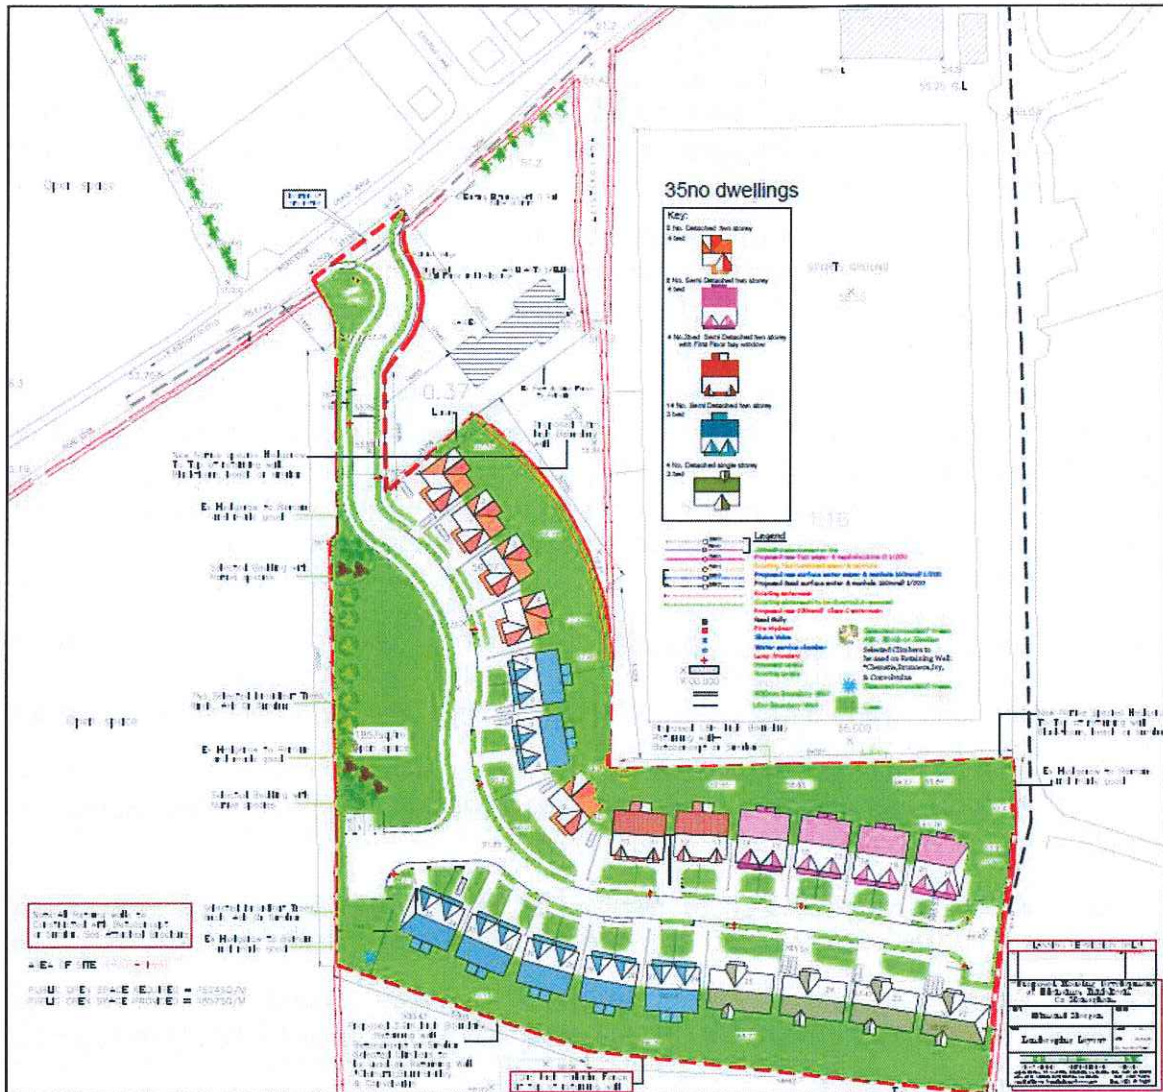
Site layout approved under permission 04/1438 which provided for 35no. dwellings (layout subsequently amended under permission 09/478)
